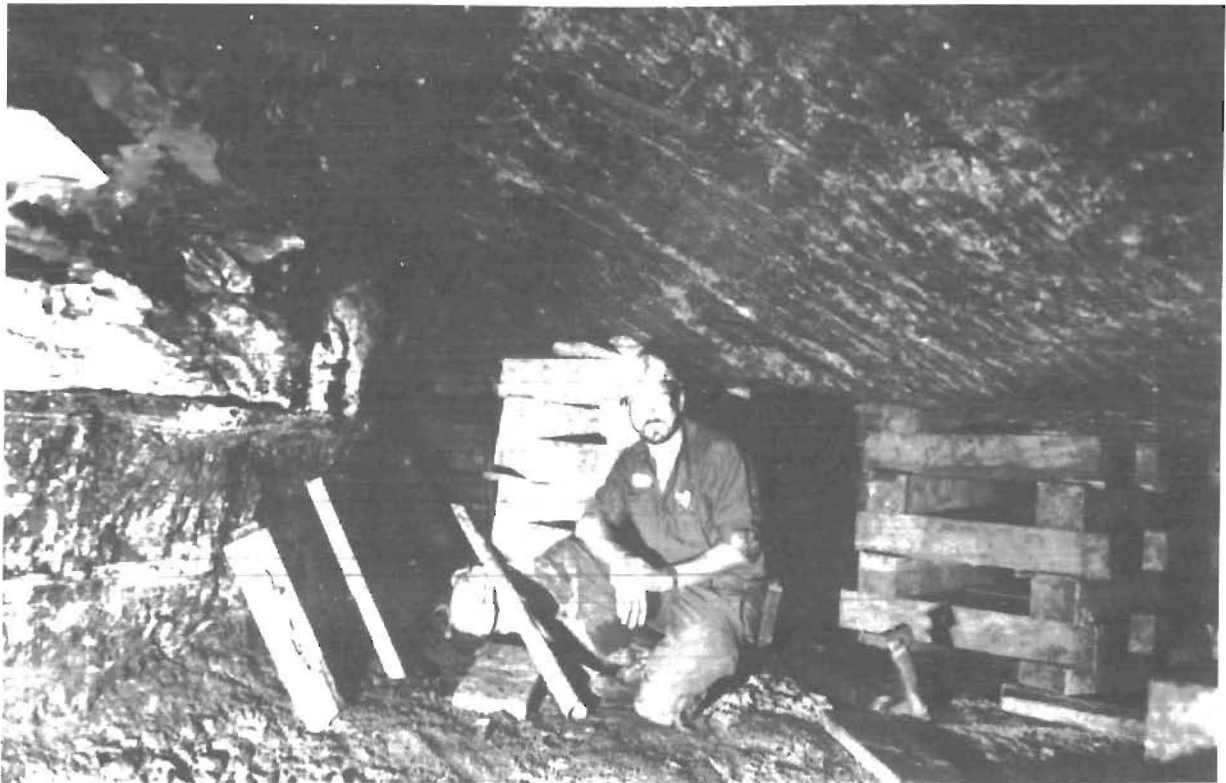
Bedding plane fault rising into roof, showing roof fall caused by section of roof spalling away from fault plane.
